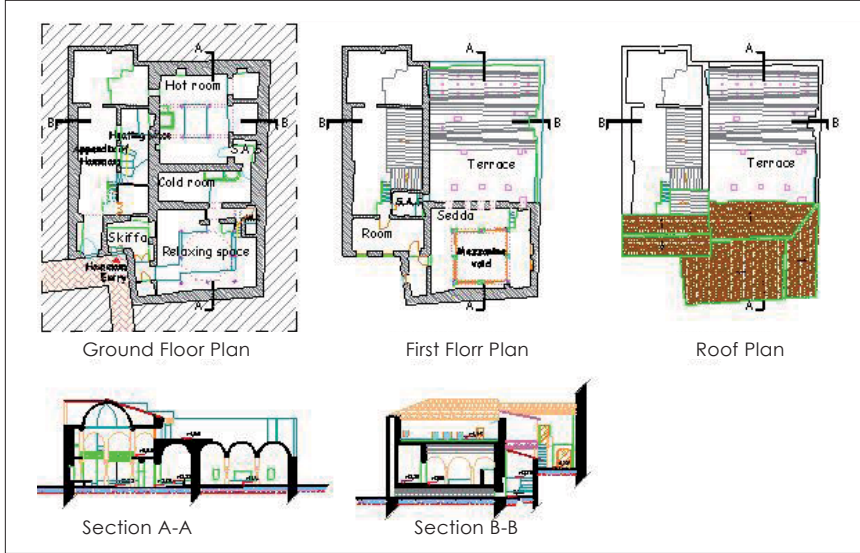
Plans and Sections of Hammām Suq El Ghezal. (Source : Laboratoire LVP 2006).
